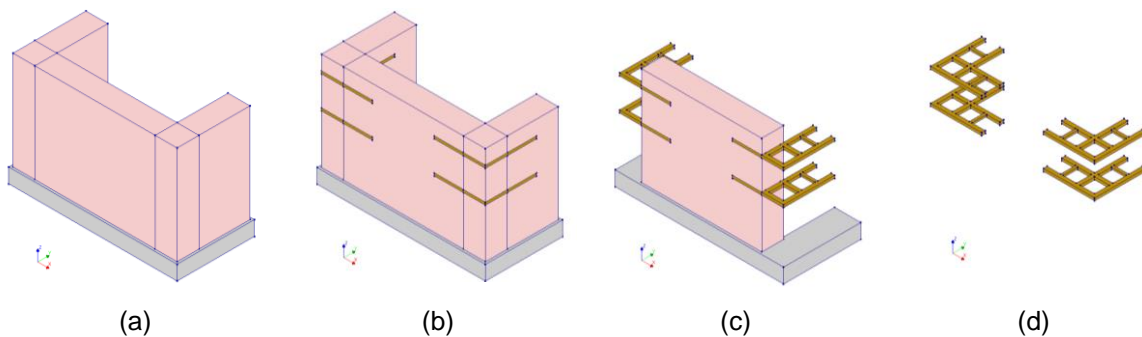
Masonry walls model – (a) Unreinforced masonry; (b) and (c) Timber-reinforced masonry; (d) Timber laces.
